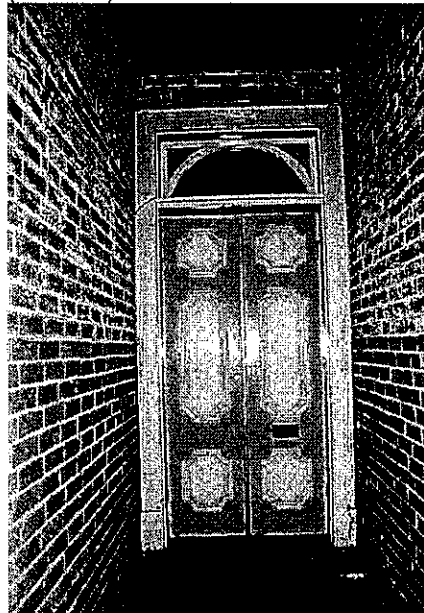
Interior, Exchange Hall (space H01). Detail of panellled double timber Call Room doors from the northern passage.
